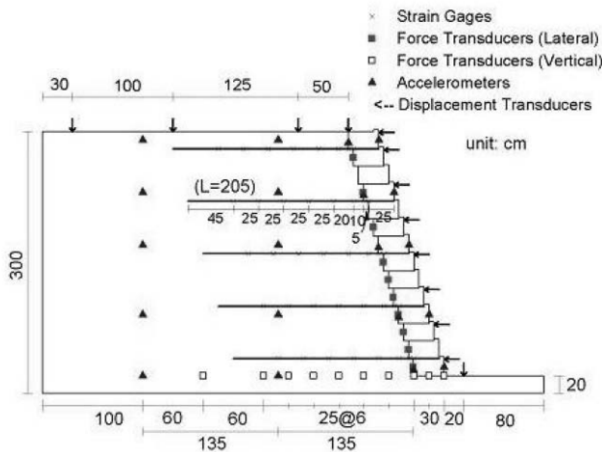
Cross section through an instrumented geogrid reinforced modular block retaining wall (Ling et al. 2003).
